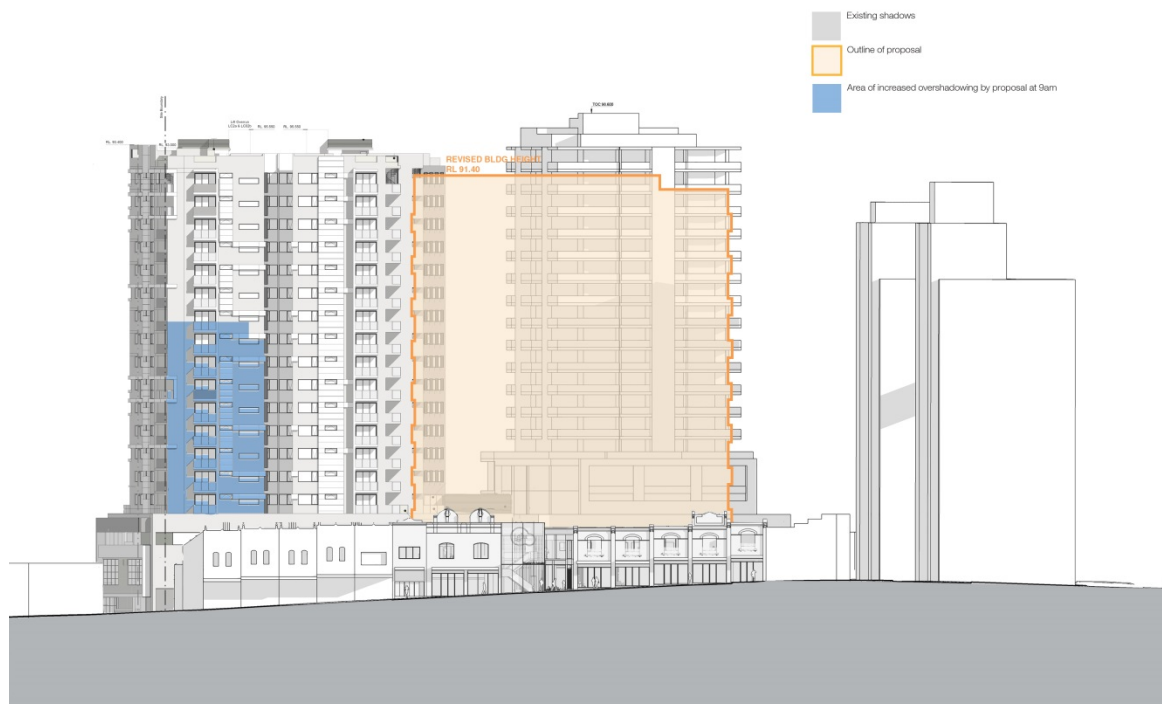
Additional overshadowing cast at 9am on 21 June (winter solstice)
